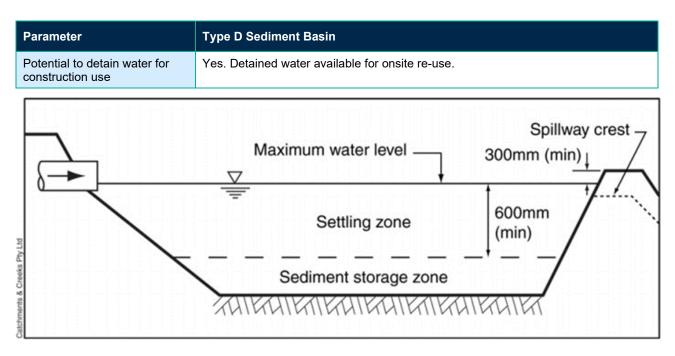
Typical section	through Type	D sediment basin	(Source: IECA, 2008)
